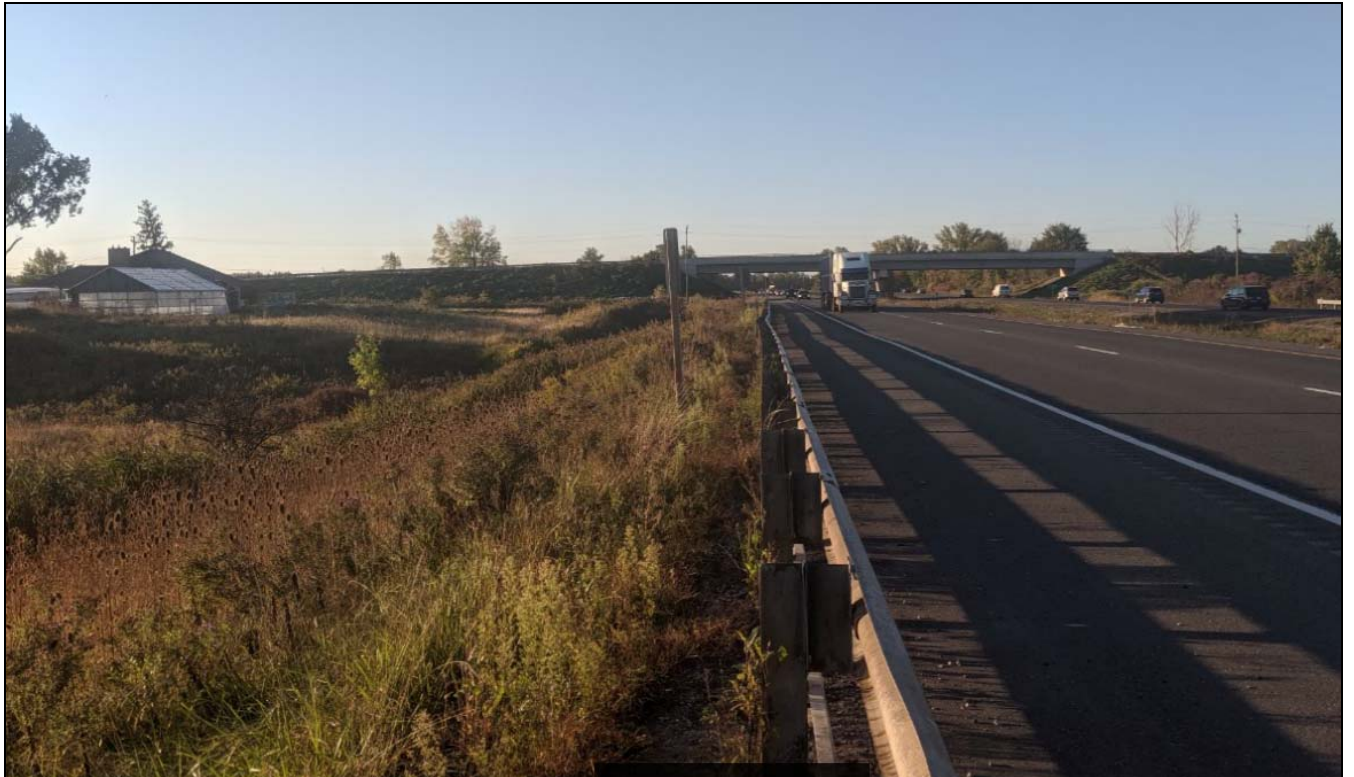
Highway 406 NBL at the culvert location, looking south towards Port Robinson Road
